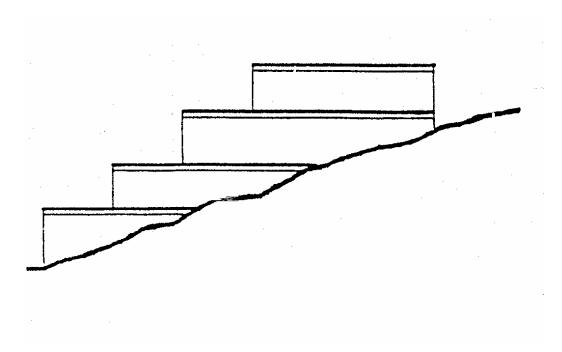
Horizontal building modulation. Following topography helps building mass conform to terrain.
